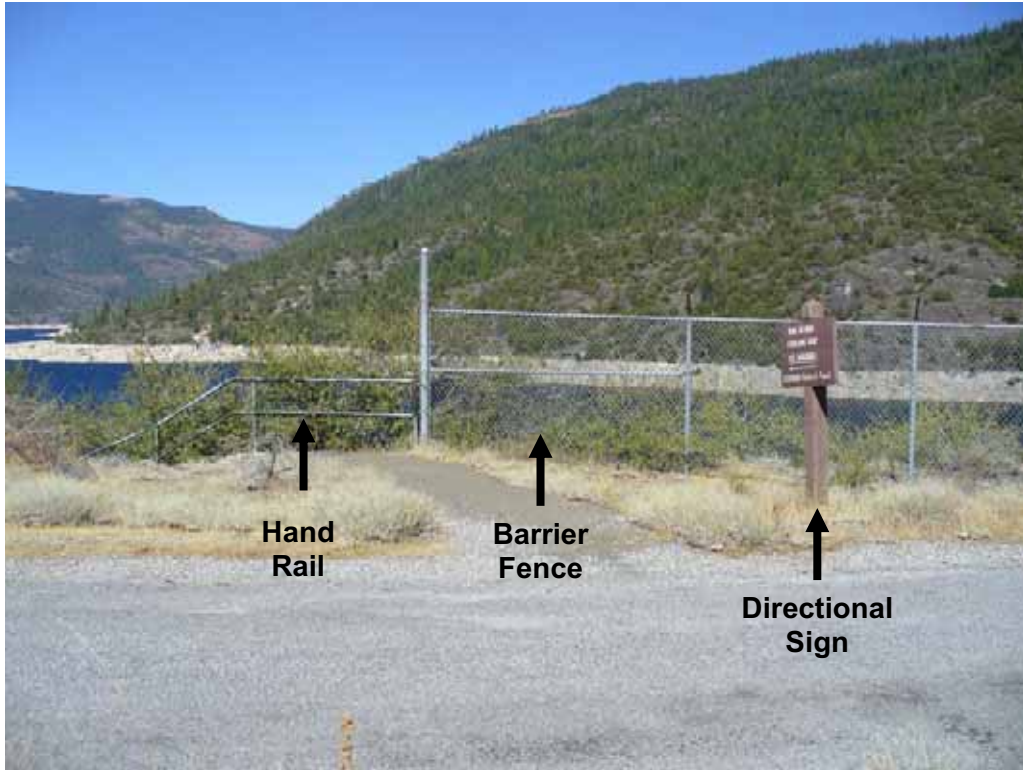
Entrance to trail/stairway. Note barrier fence, directional sign, and steel hand rail. (8/4/08)
